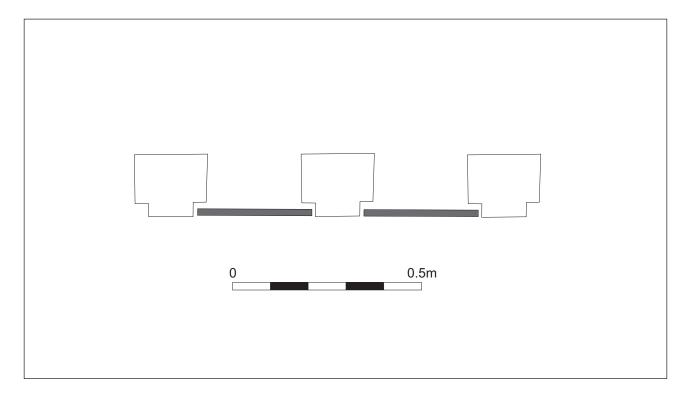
Schematic plan of revetment construction to show rebates with inset planks
